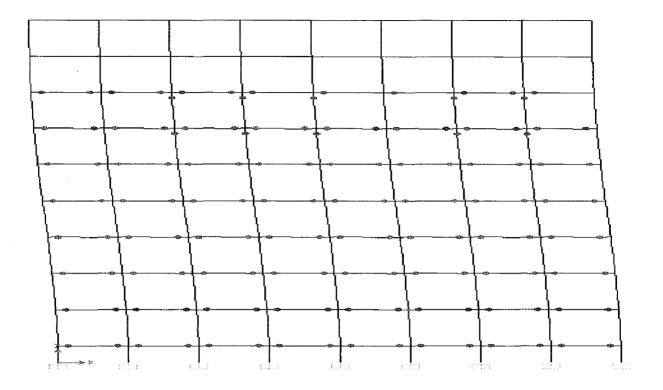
Yield Pattern at Ultimate Point for 9-Storey Building Designed for Gravity in Longitudinal Direction
